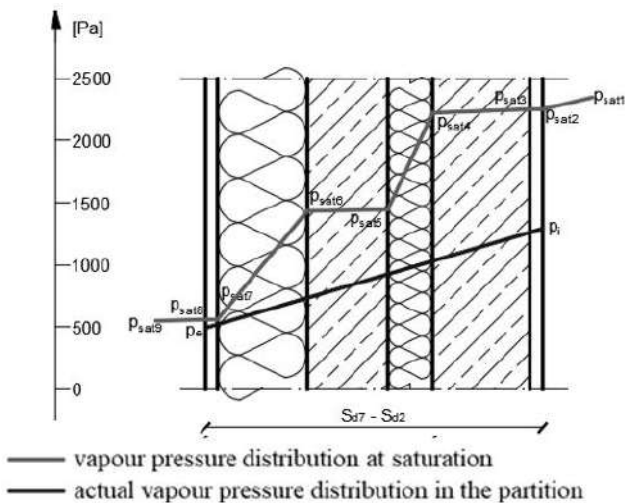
Distribution of water vapour pressure in the vertical section of the curtain wall in November in the building at 6 J. Śniadeckiego Street after thermomodernisation
